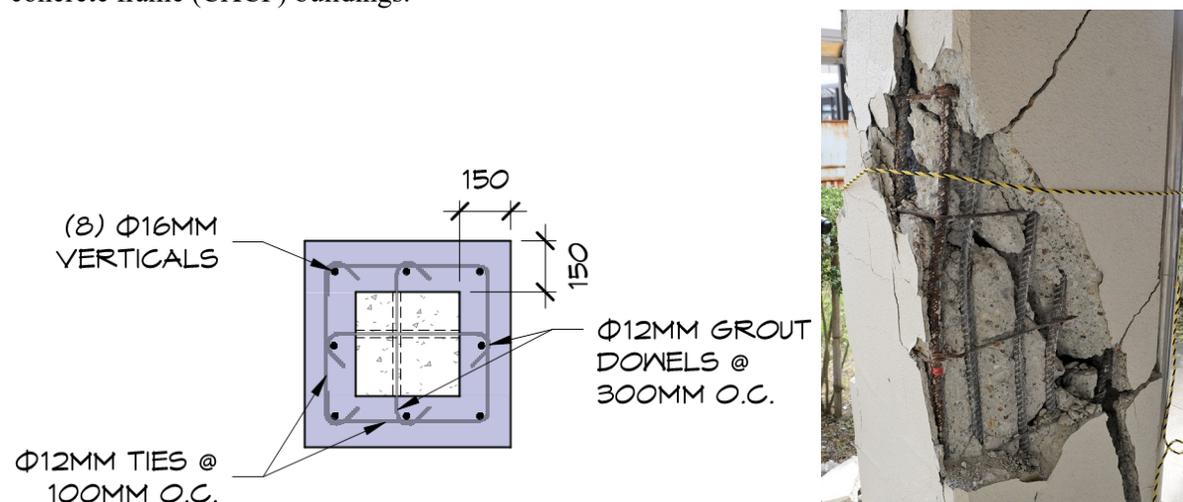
Reinforced concrete column jacket on left. Shear failure in column due to insufficient tie reinforcement.
